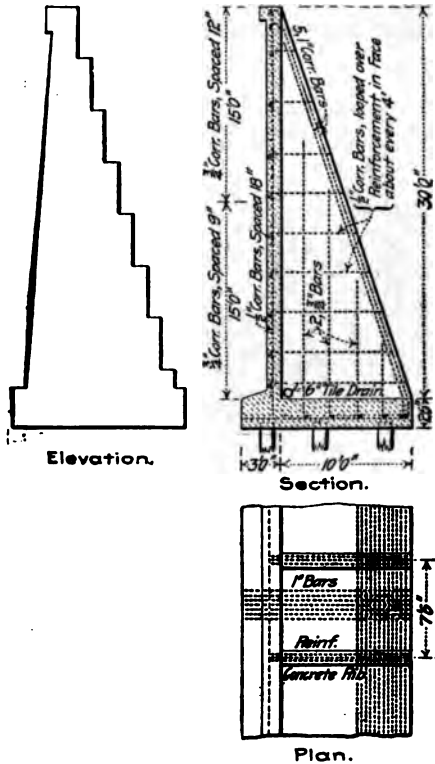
Retaining Wall, Great Northern Ry., Seattle, Wash.
